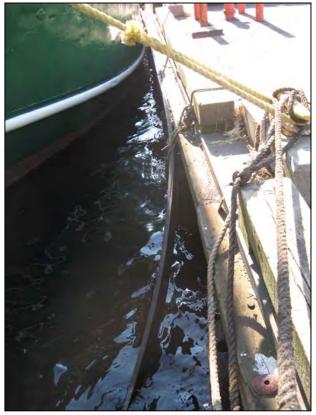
Loose UHMW rub rail near Station 6+90.
